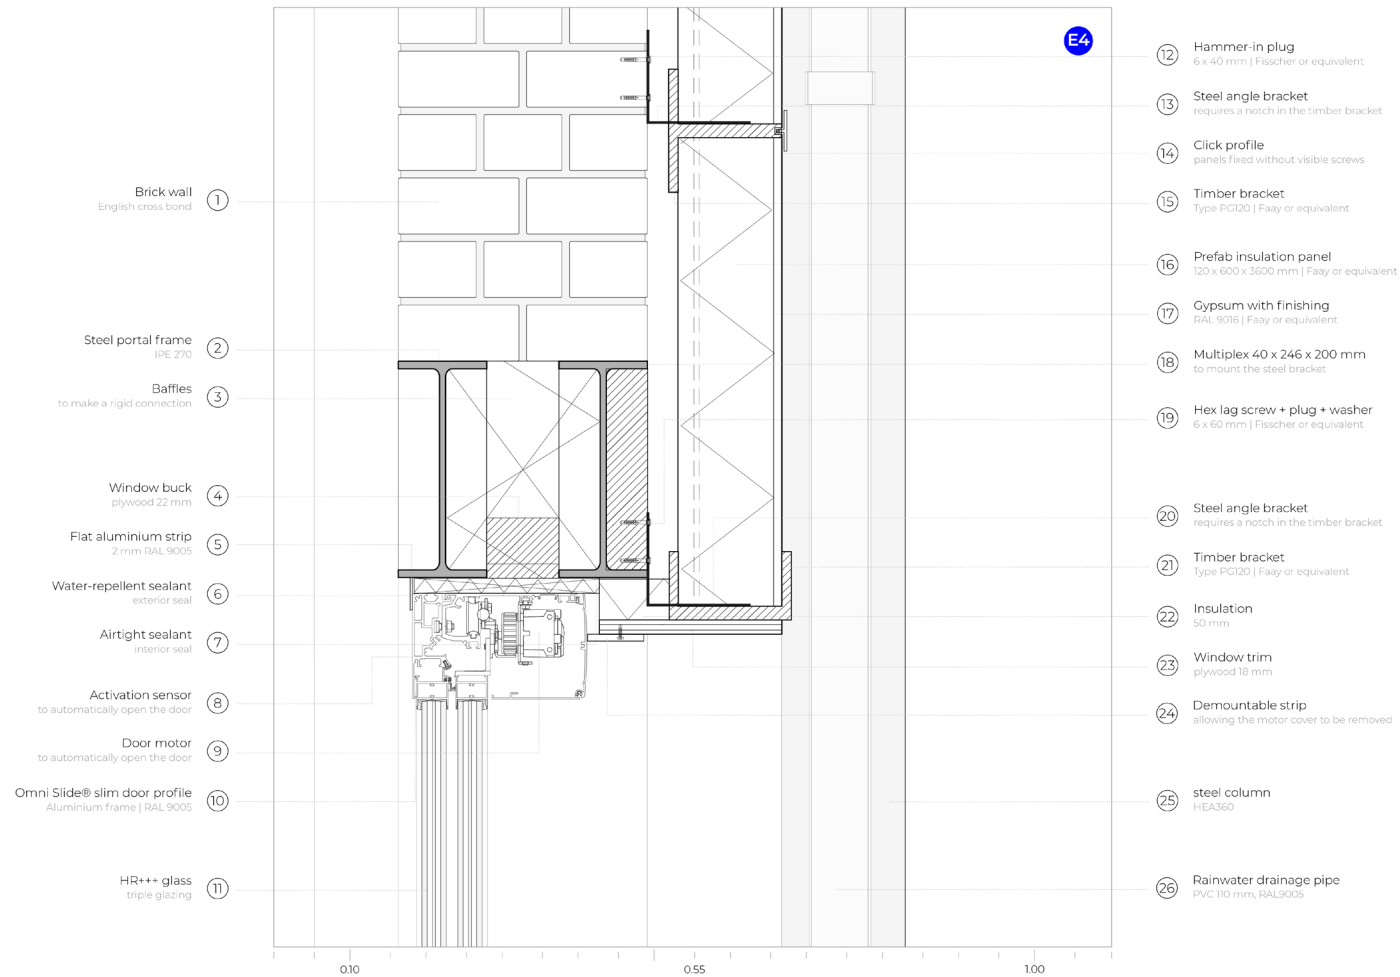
# DETAIL DRAWINGS | VERTICAL SECTION E | SCALE 1:10
